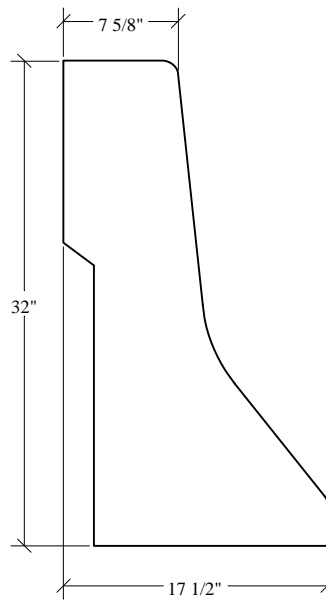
Cross Section of a Typical Type T502 Parapet Rail
